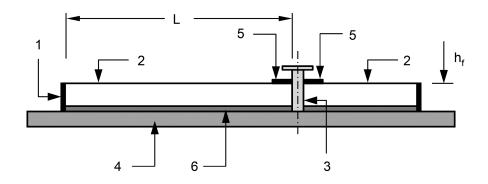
Illustration of a flat sample arrangement having no visible posts and where there are no designed cavities on the floor/wall facing side of the test sample
